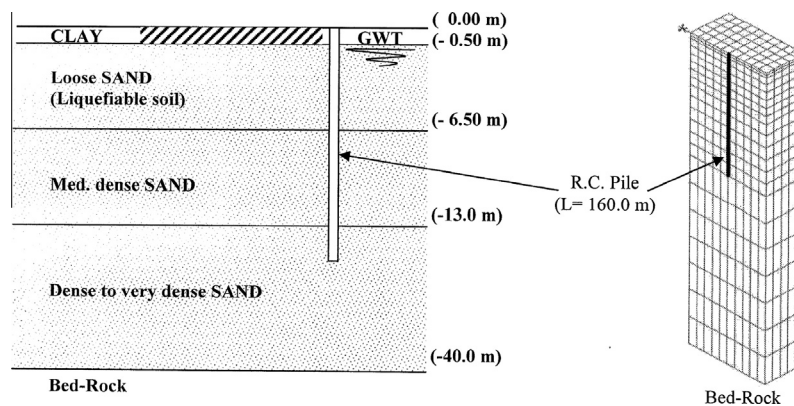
The proposed soil stratification and half-sectional elevation numerical Model.
